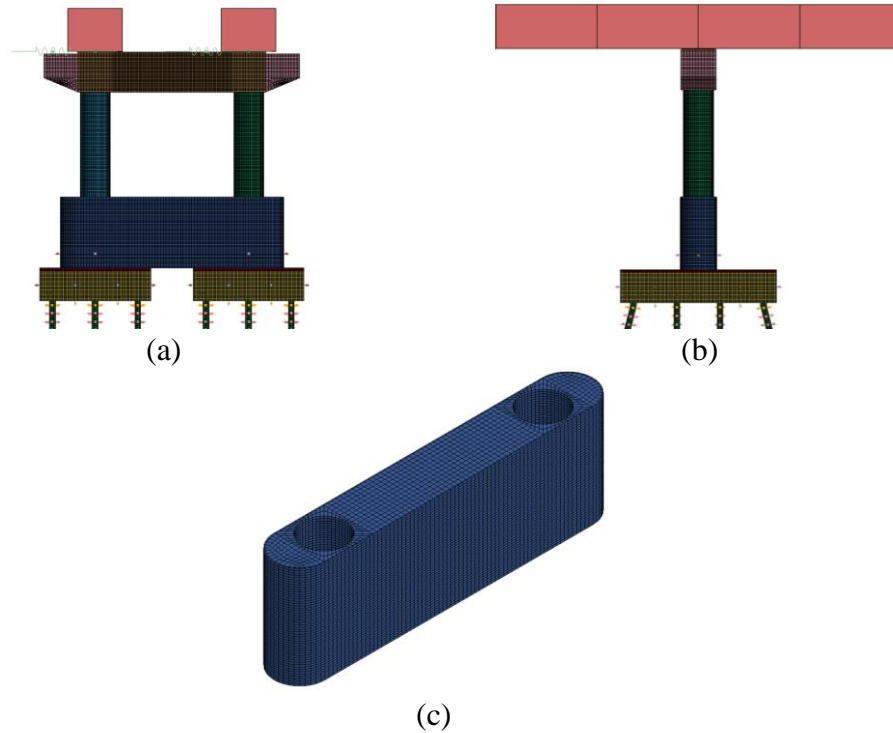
Frame pier model with crash wall showing: (a) side view from road, (b) view in crash wall's longitudinal axis, and (c) crash wall concrete.
